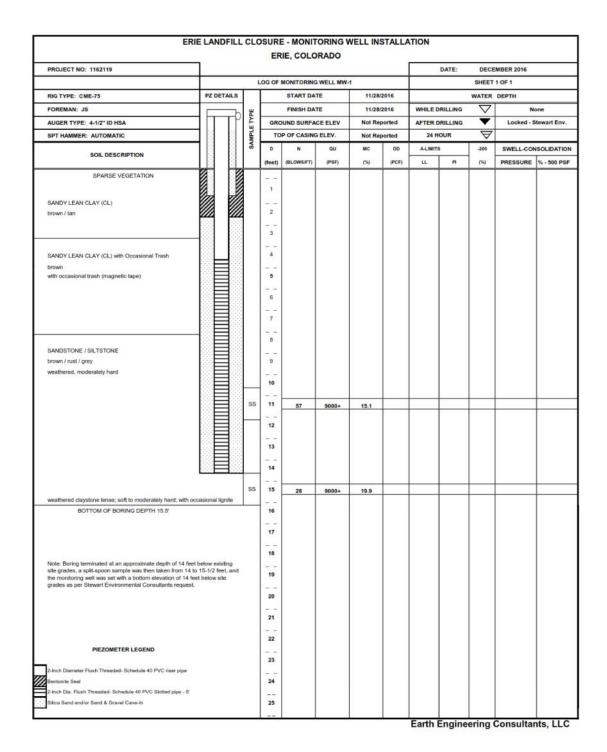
Earth Engineering Test Boring SEC MW-1
